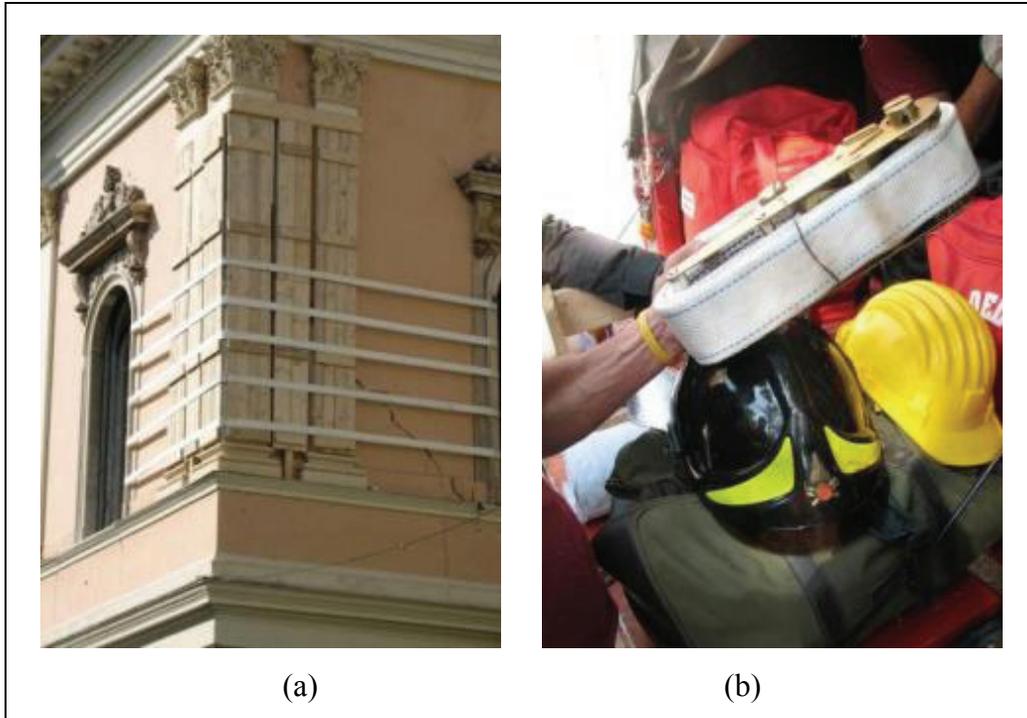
(a) Hoop retrofit intervention on damaged corner in L'Aquila with (b) high-strength polyester bands
